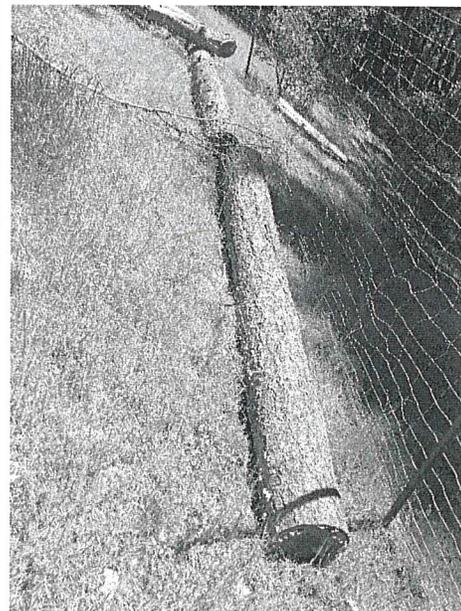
and 2: Views of Cultivation Site A facing southwest.
